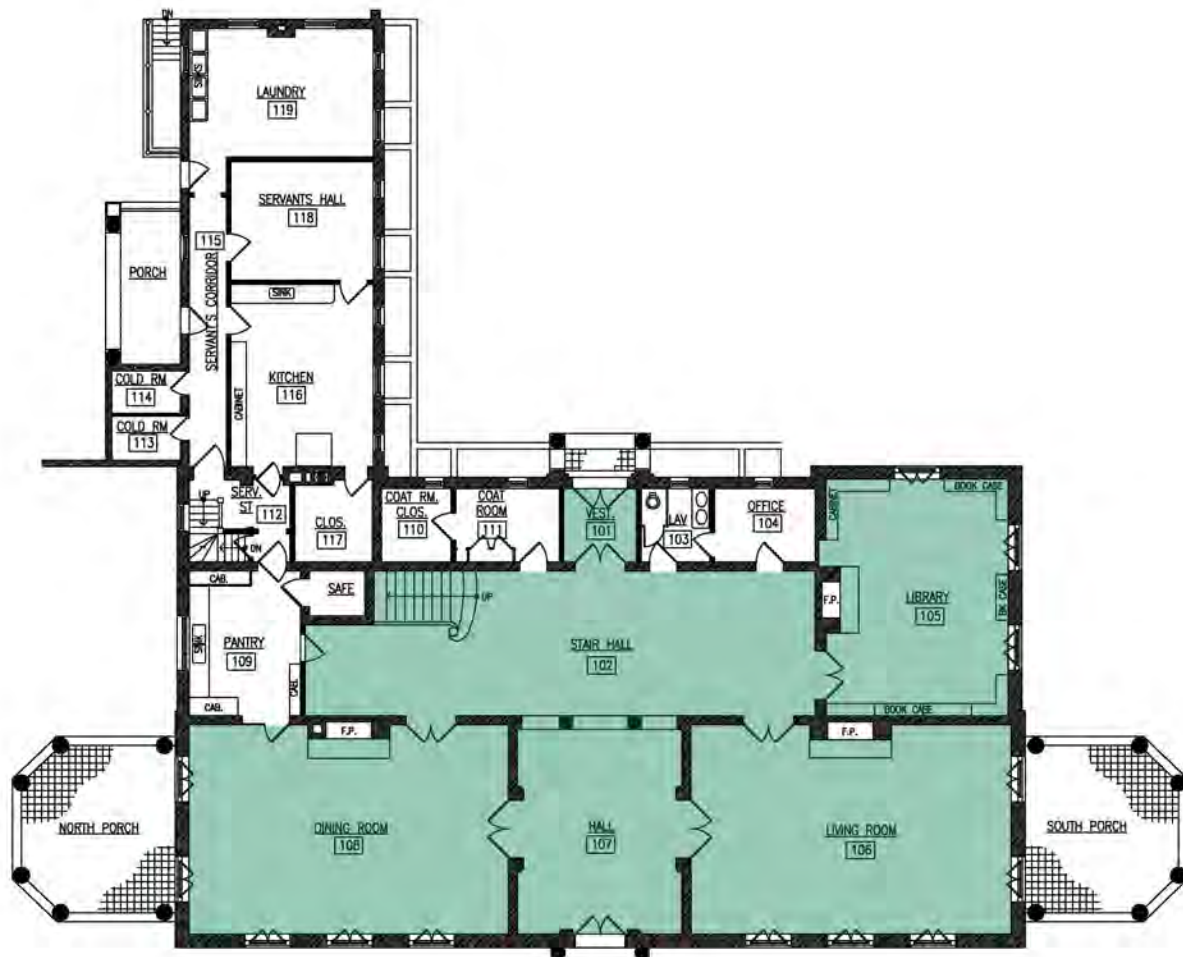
First floor plan showing location of formal spaces. (HA, 2015)
